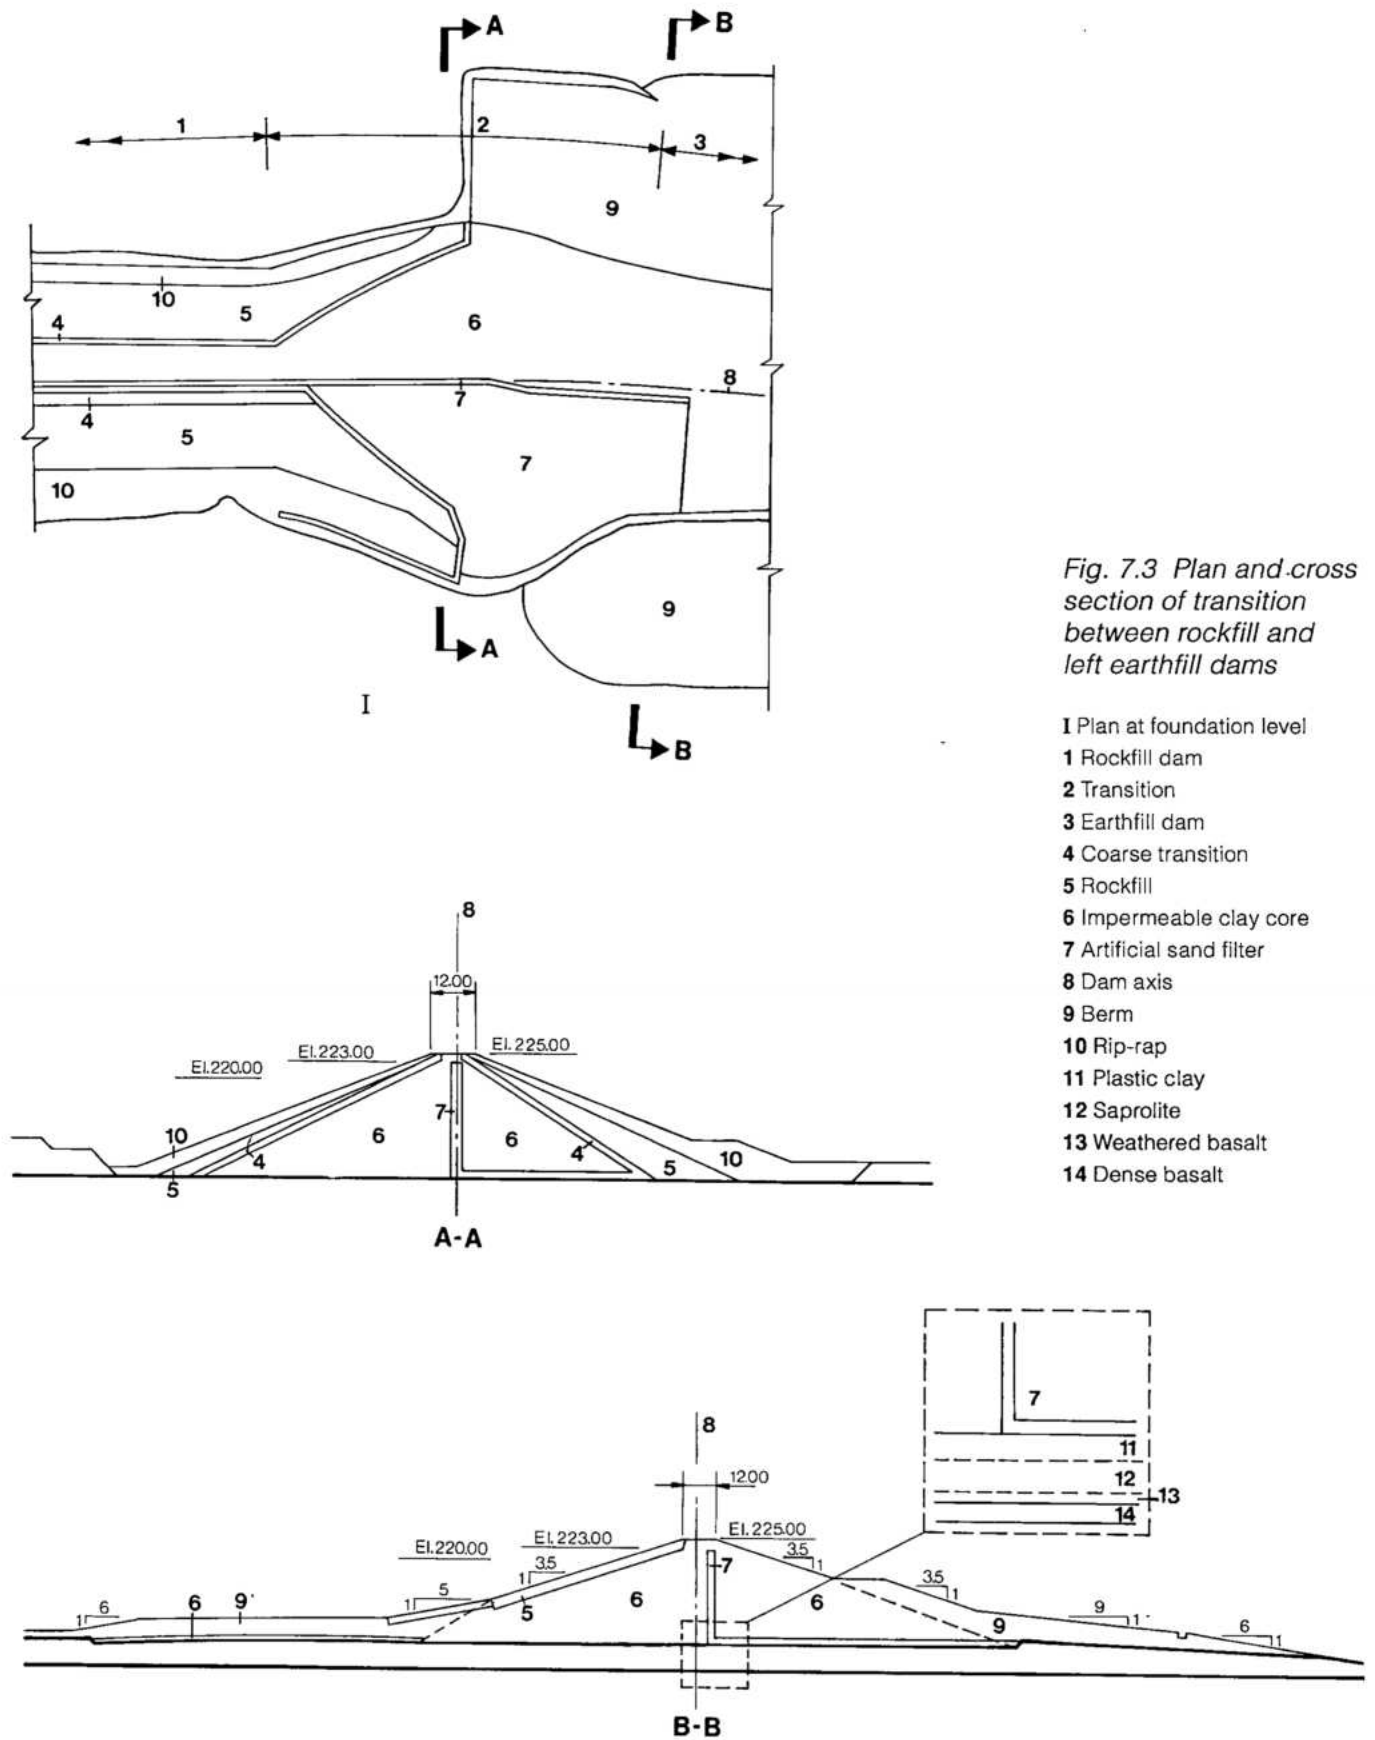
Plan and cross section of transition between rockfill and left earthfill dams
